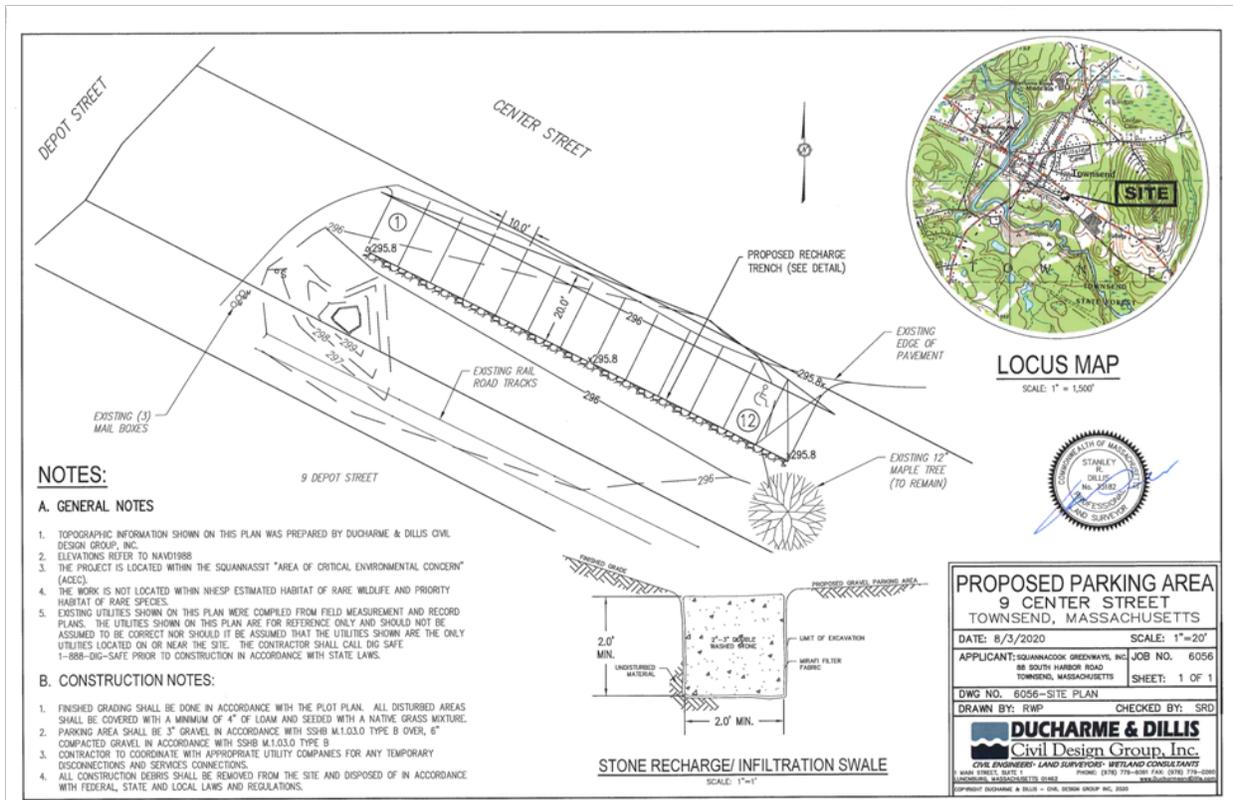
Parking area in Townsend near the intersection of Center and Depot Streets
